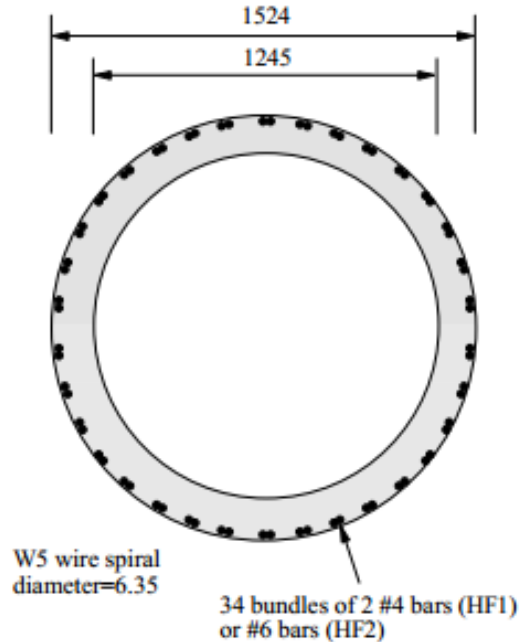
Cross-Section Dimensions (in mm) of the Hollow Column Tested by Hoshikuma and Priestley (2000), (1 mm = 0.0394 inch)
